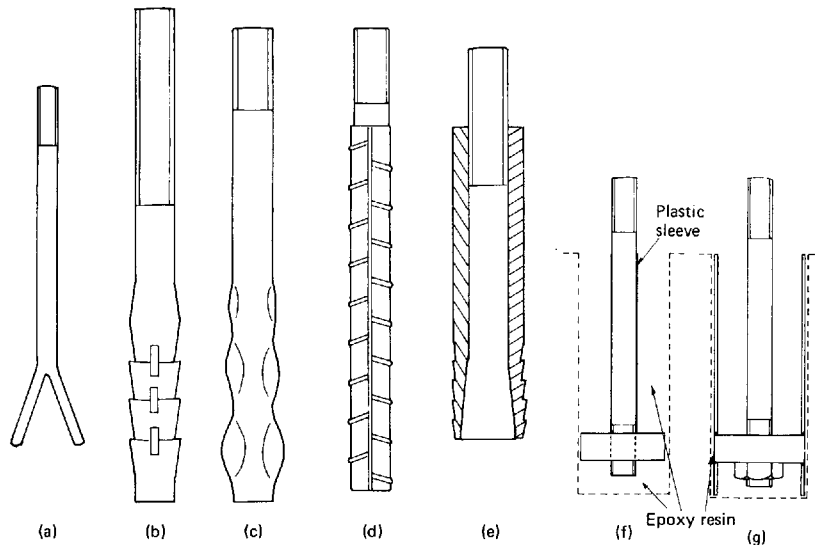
Examples of foundation bolts. (a) Split-end bolt (Cooper and Turner); (b) rag bolt (GKN); (c) indented bolt (GKN); (d) rebar bolt; (e) expanding bolt (Rawlplug); (f) block-ended bolt (Holst Wales); (g) tube bolt (Holst Wales)
